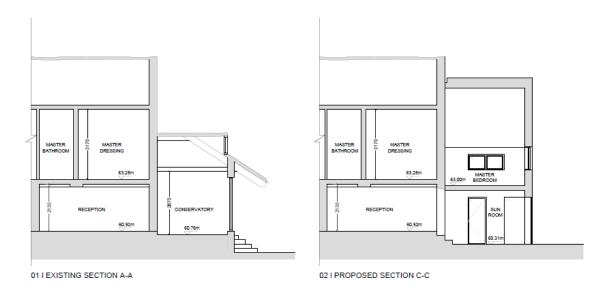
Existing and Proposed section (Robinson Van Noort, 2023)
